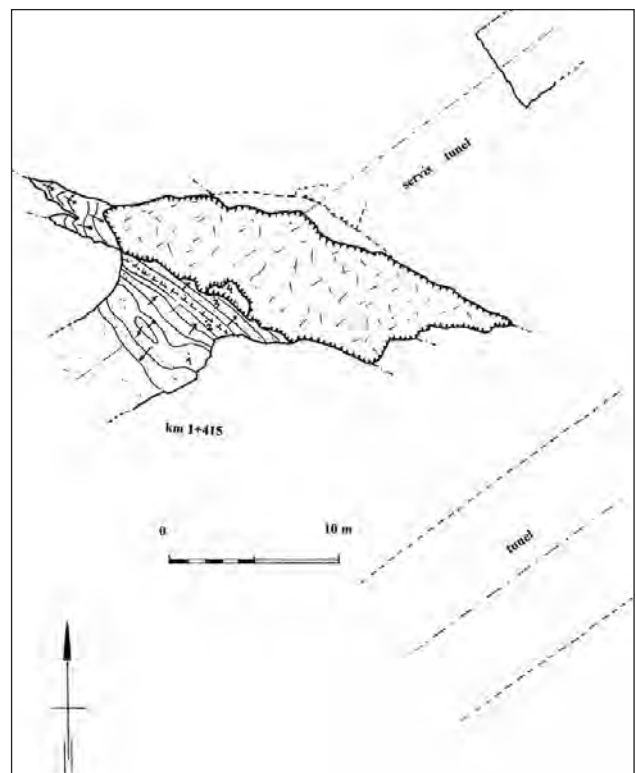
Cave plan of cavern at km 1+415 in Biokovo tunnel.
